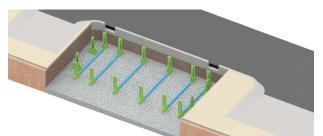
Spread base layer aggregate and set the FRP assembly frames in place
